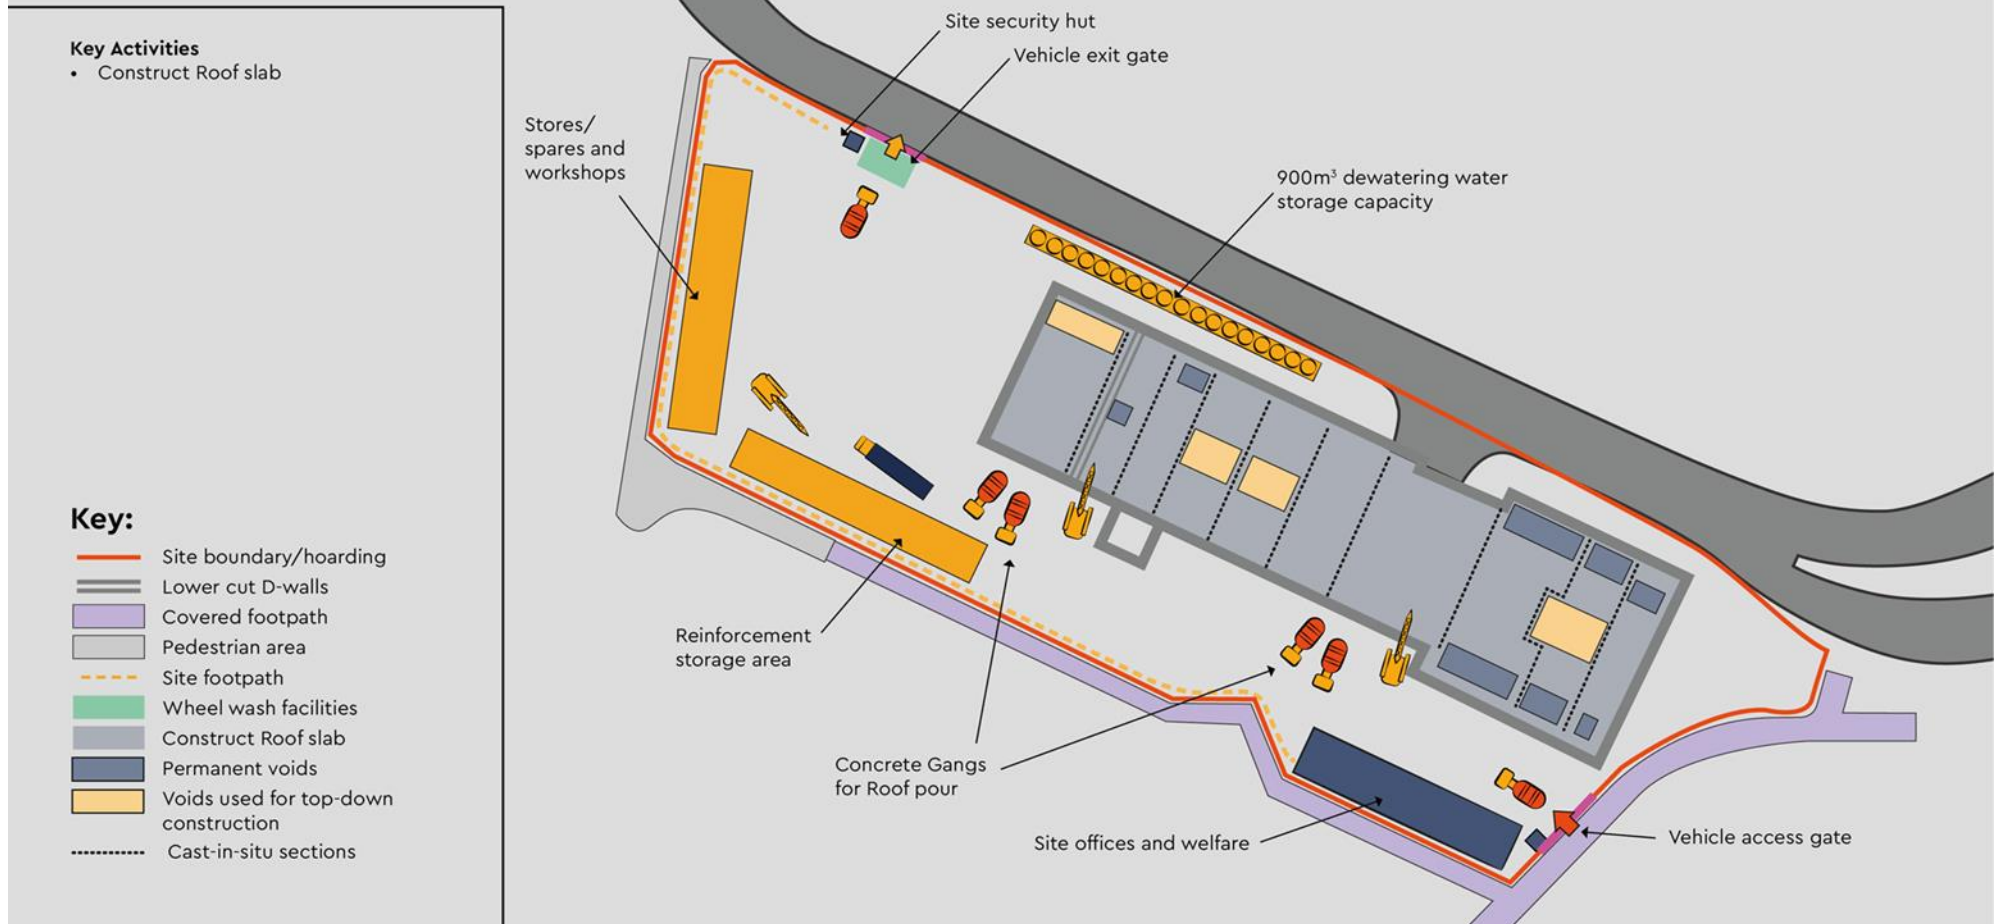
Dublin Airport Station Stage 4 - Roof Slab Construction Begins
